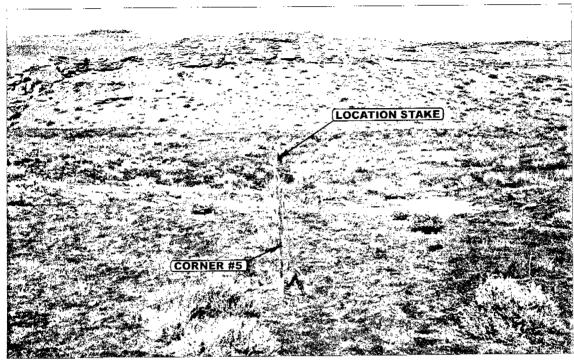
PHOTO: VIEW FROM LOCATION STAKES TO CORNER #5
